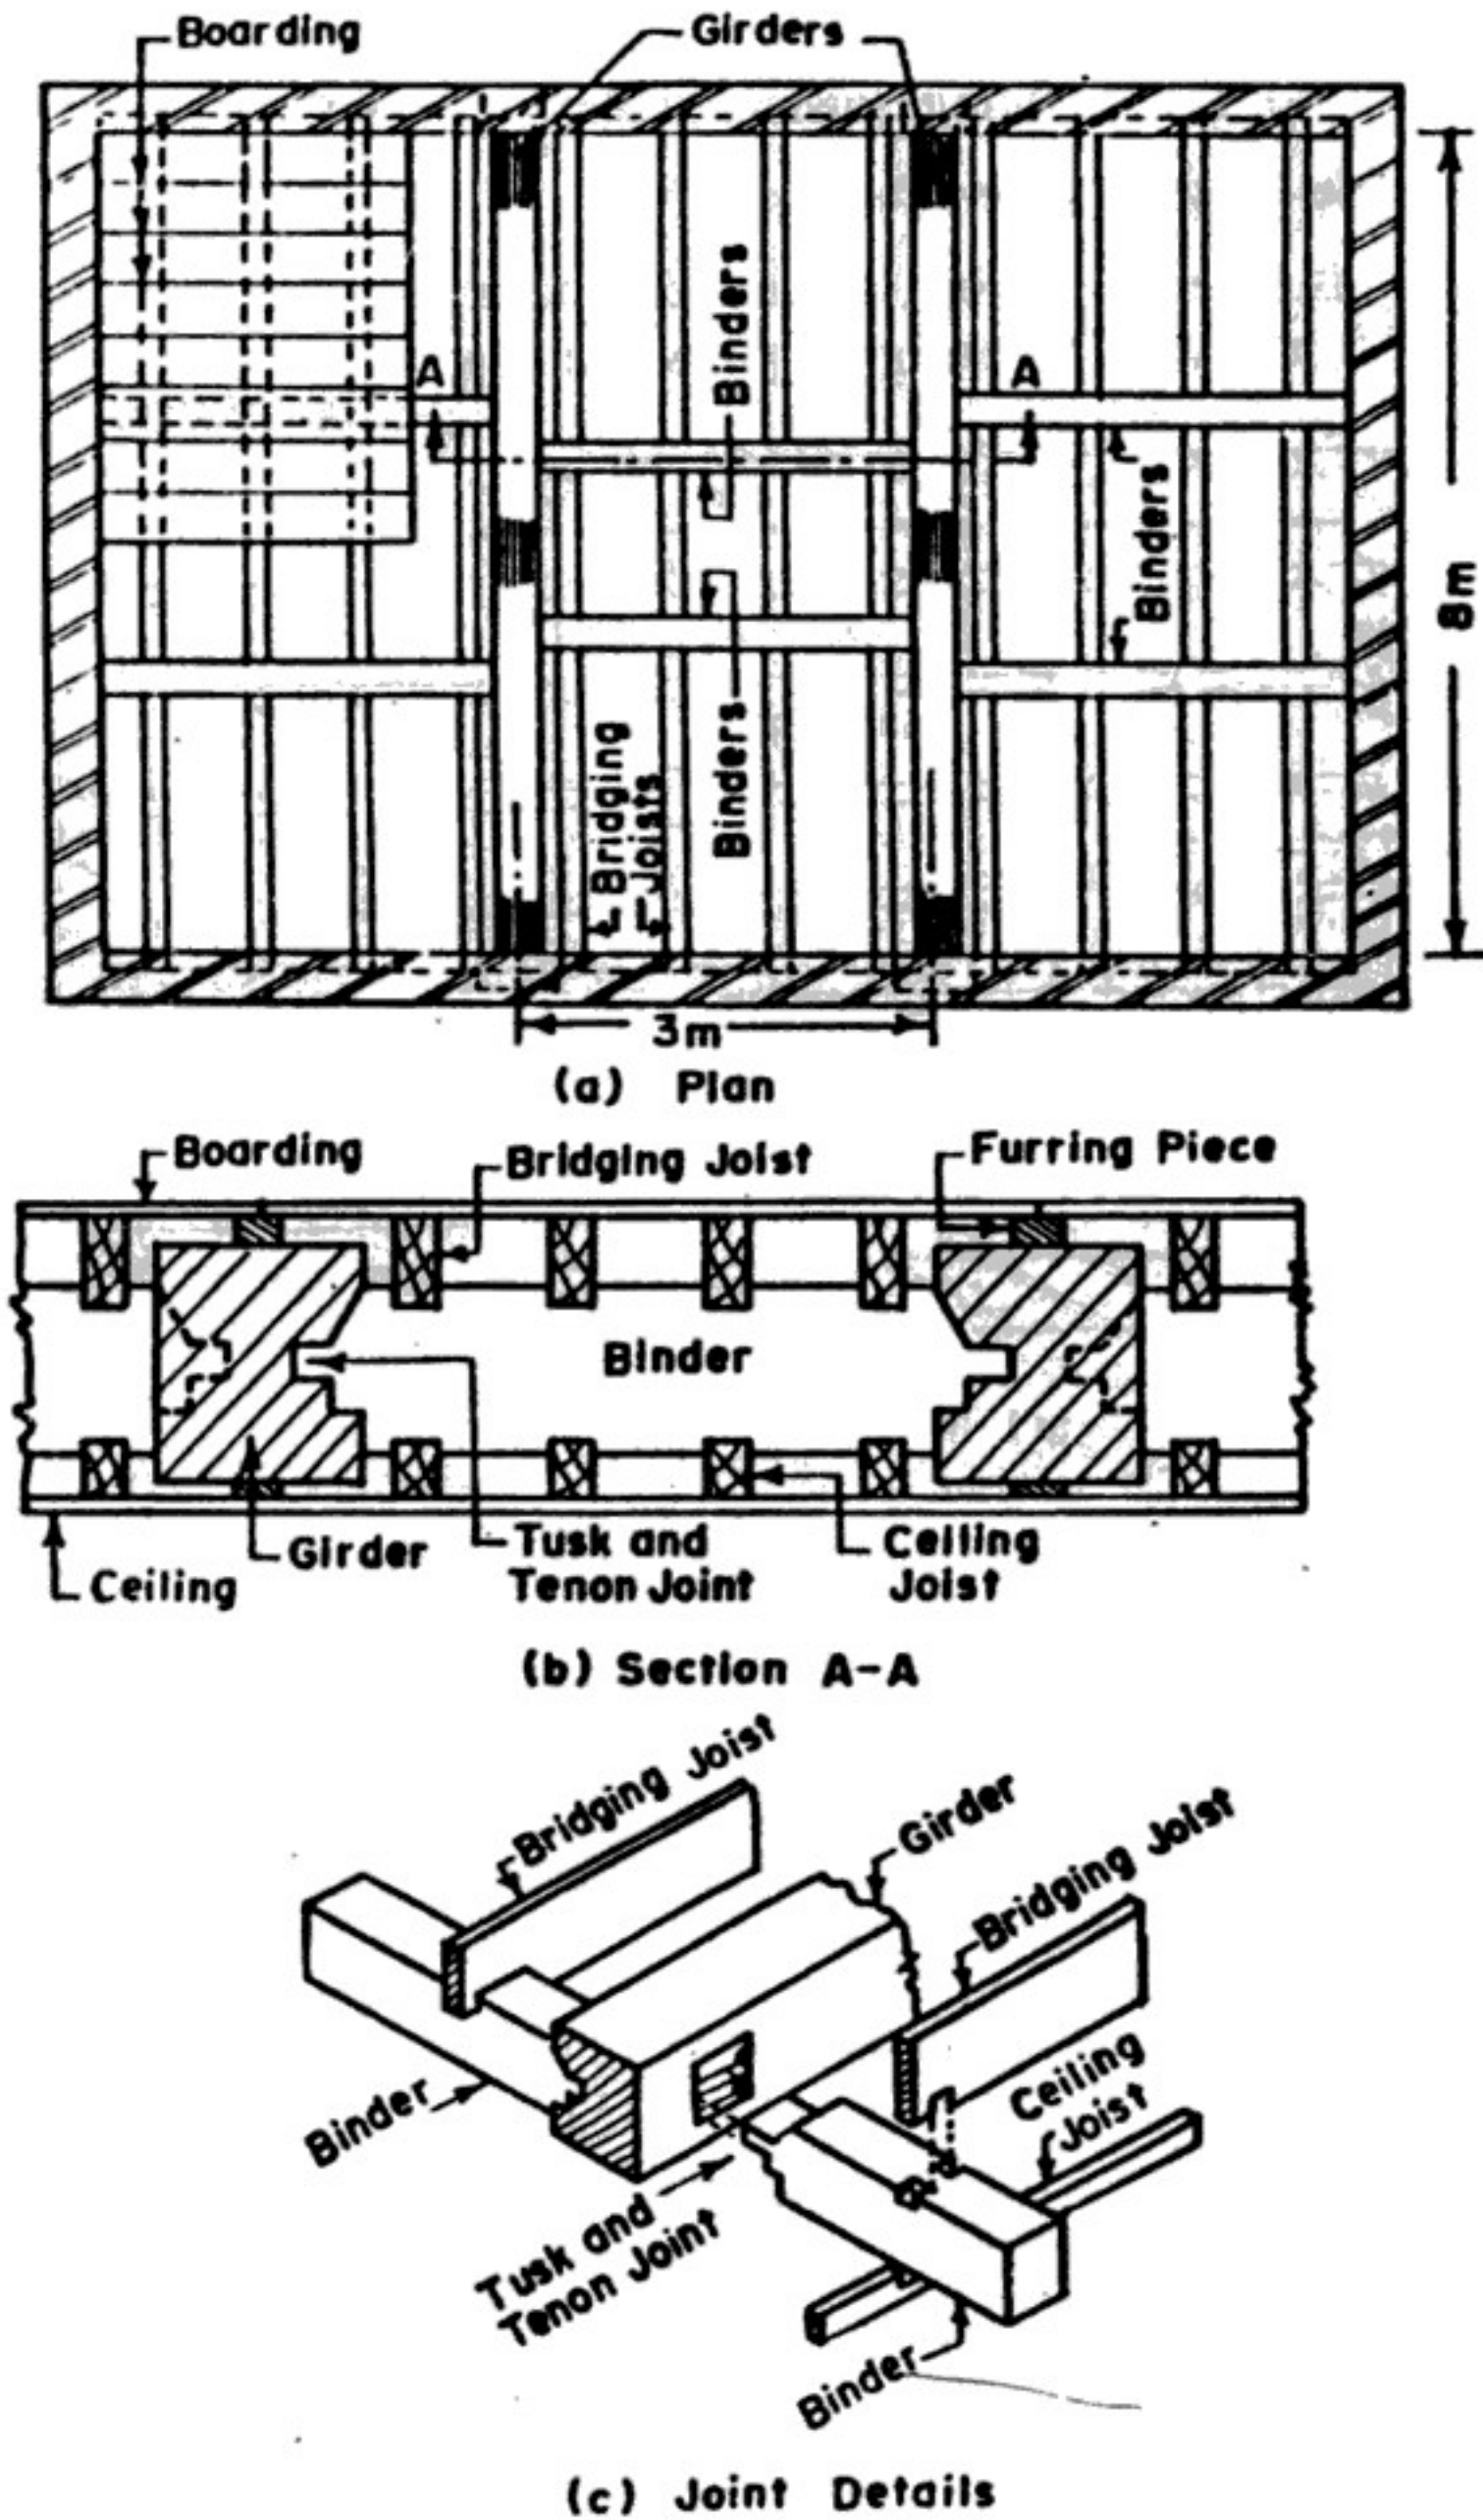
FRAMED OR TRIPLE JOISTS TIMBER FLOORING.
